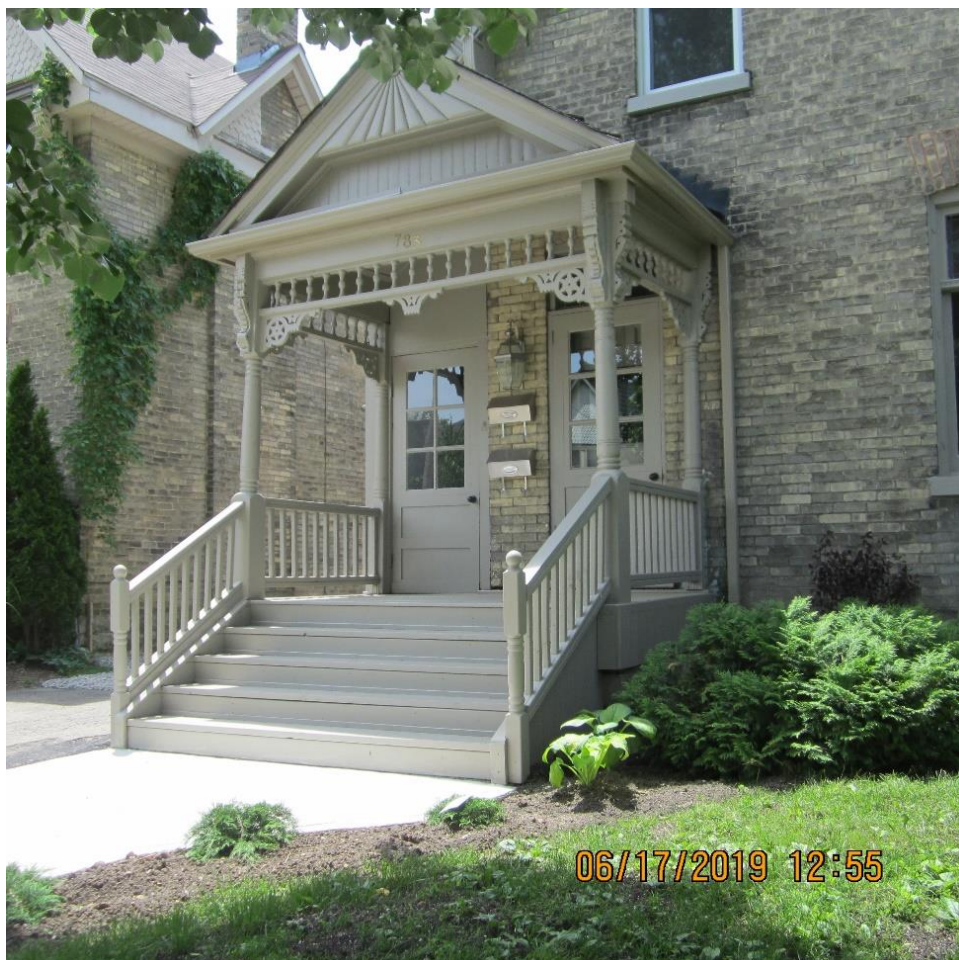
Property at 783 Hellmuth Avenue in June 17, 2019 with new guards, handrails, stairs, and storm door.
